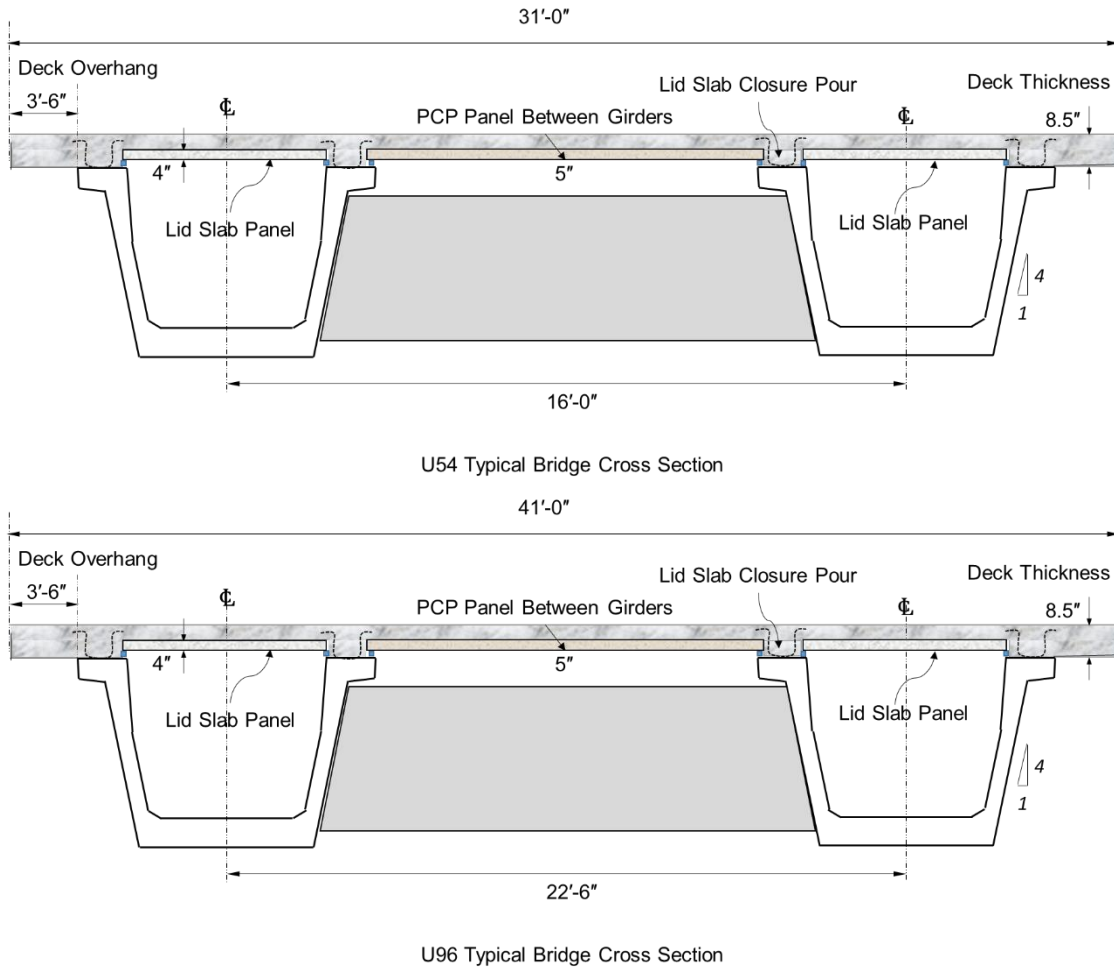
Typical Bridge Cross Section for U96 and U54
